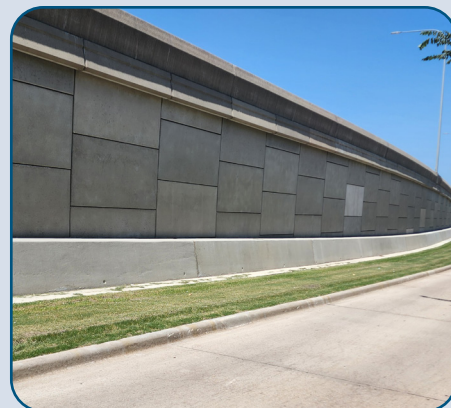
DNT near PGA Parkway – MSE Wall Stabilization.
